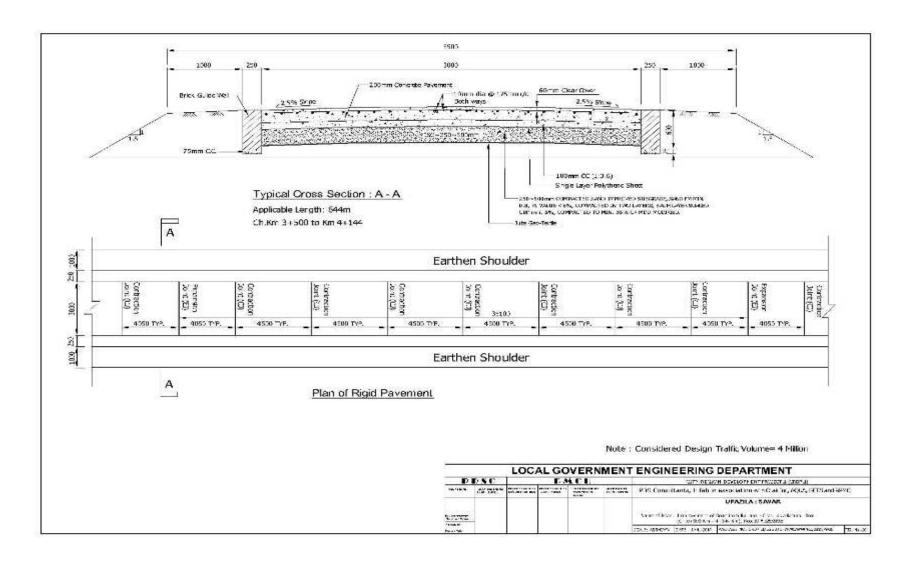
Typical cross section (Ch. 3+500 to 4+144 km, Plan of Rigid Pavement & Earthen Shoulder)
